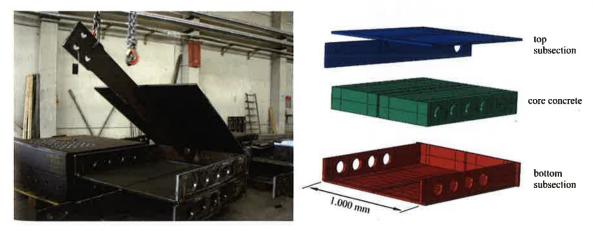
Steel subsections during assembly and schematic exploded view of a shear test specimen (T1 specimen shown as an example). Institute of Structural Engineering, TU Wien
